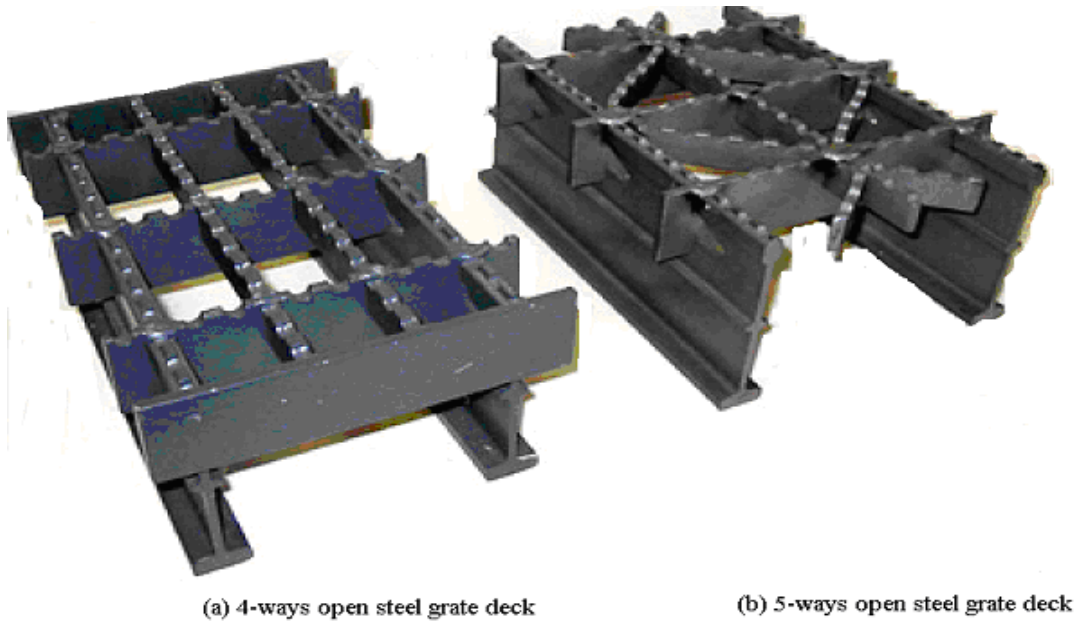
Welded Open Steel Grate Deck 4- Way and 5- Way Systems.
